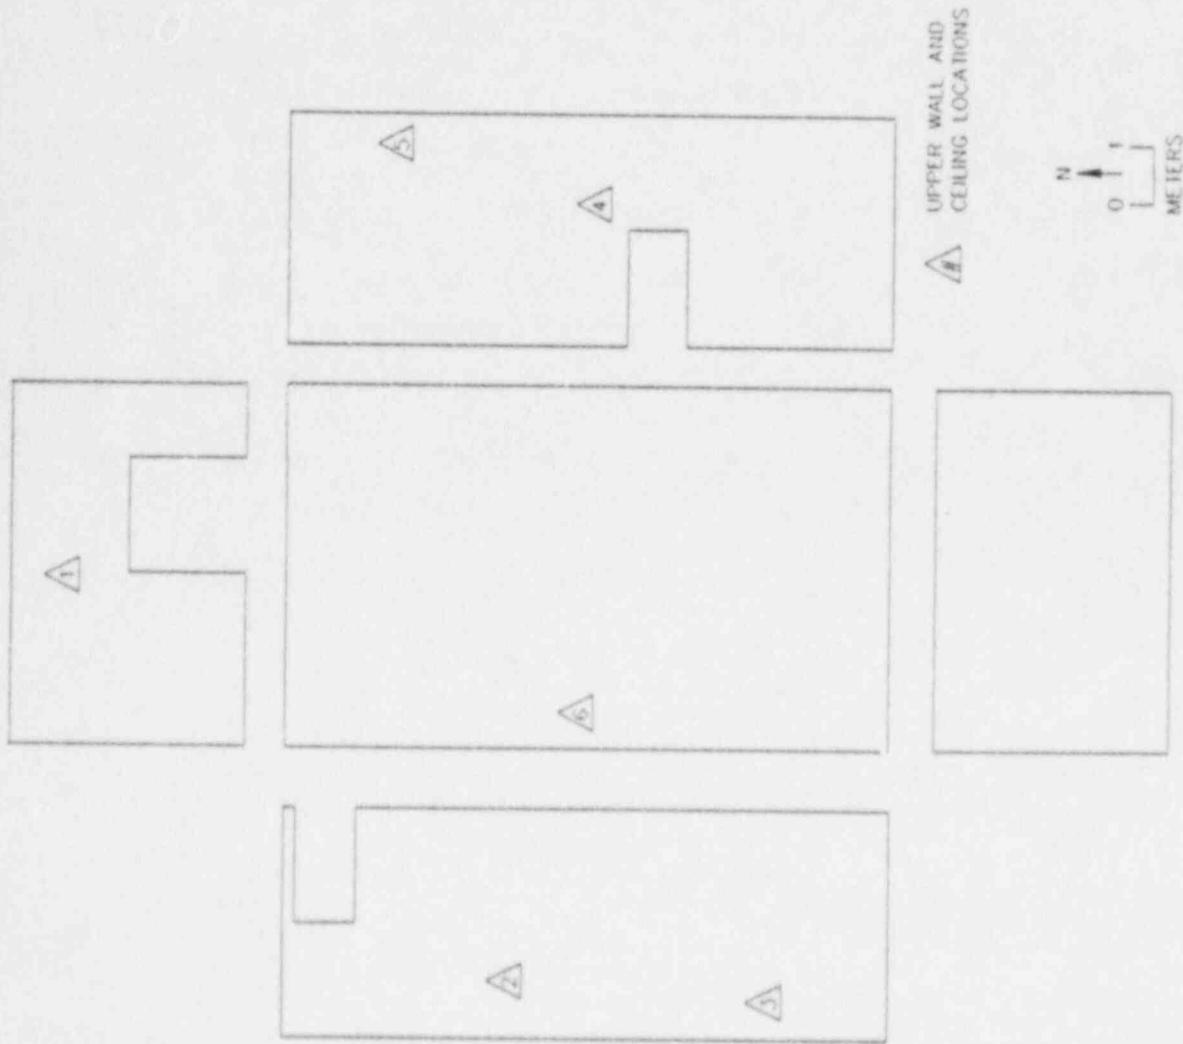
Room 50 Showing Locations of Upper Wall and Ceiling Single-point Measurements
